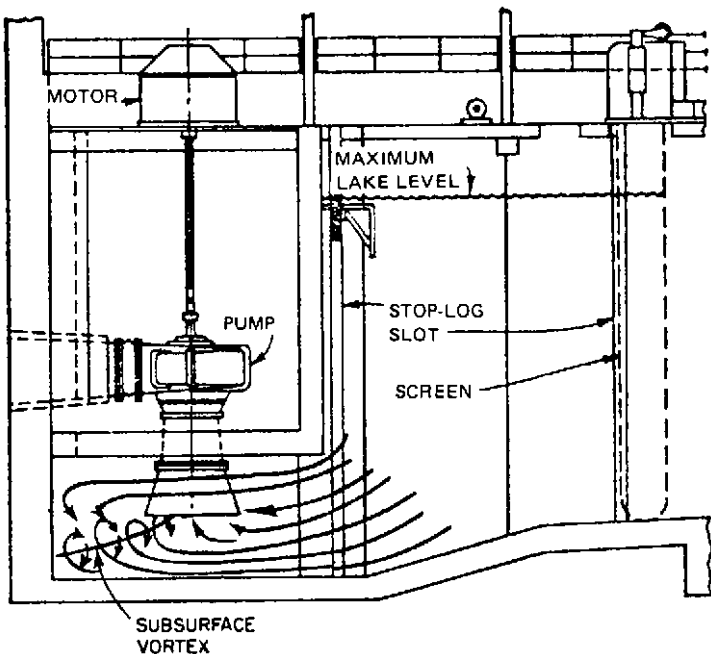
Typical vertical dry-pit pump intake. Improper spacing of suction bell relative to floor and back wall caused subsurface vortexing. Model test revealed problem and correction (Reference 4).
